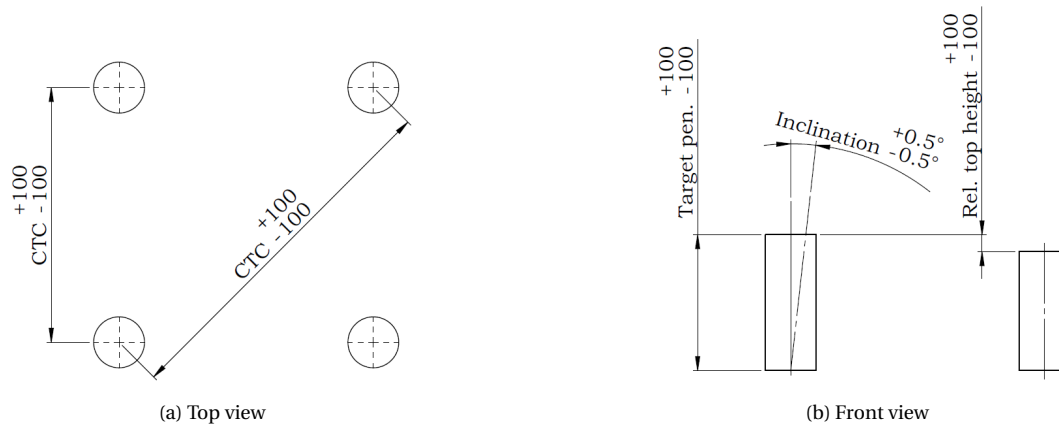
Drawing of the square footprint with the pile installation tolerances (dimensions in mm)
